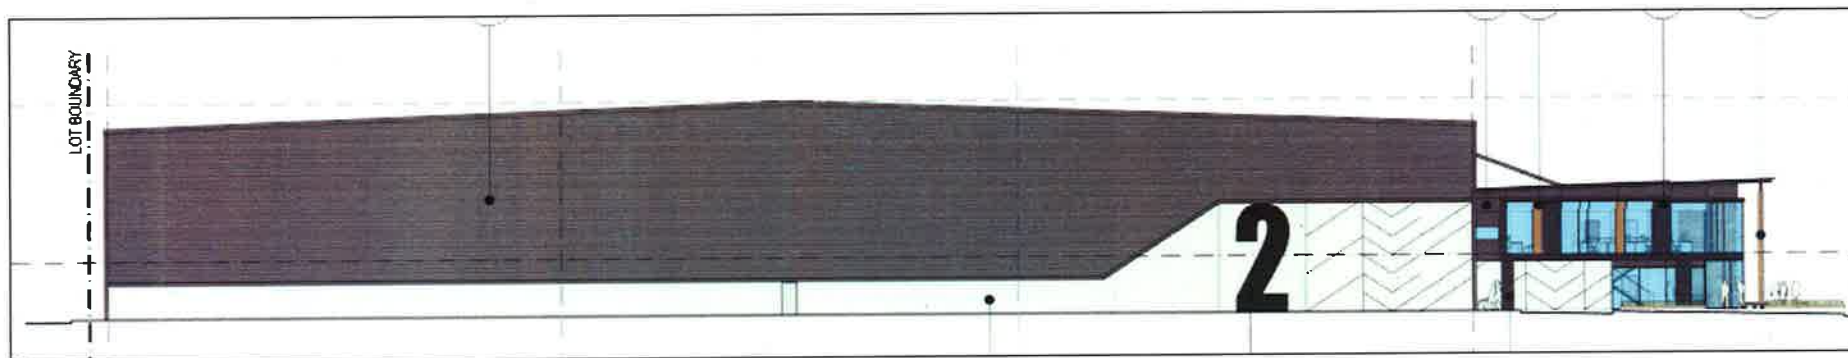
Façade Treatment Example External to Site – Building 2 Eastern Elevation to Wallgrove Road
